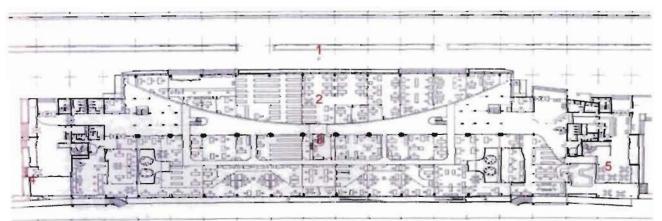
New mezzanine office plan above terminal entrance level. (Wale. 1993: 8)
